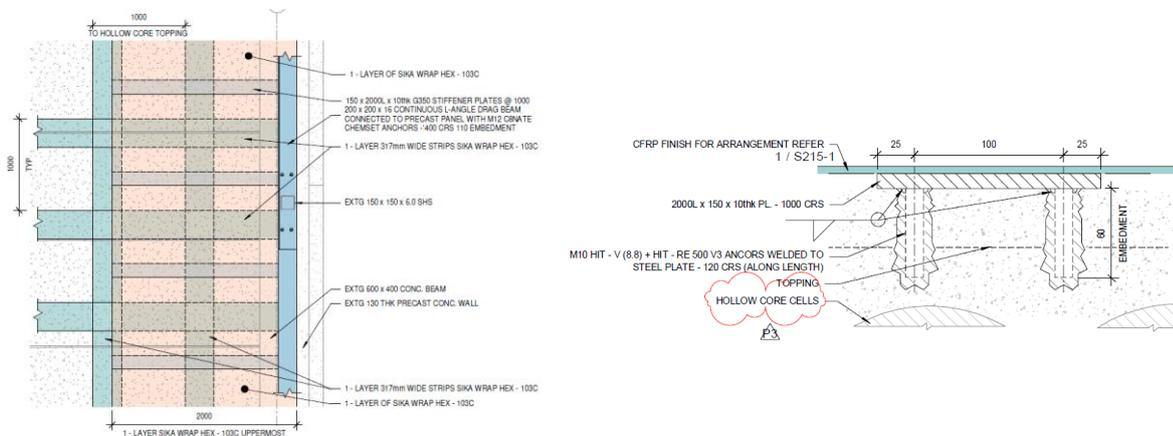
Steel plates at the perimeter. Plan view (left) and cross section (right)
